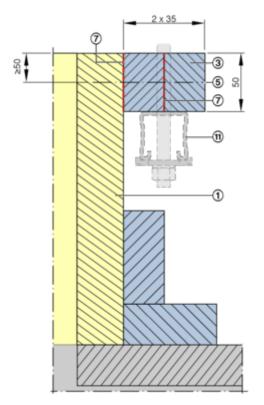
Installation detail H: Fastening the suspension for horizontal damper position
